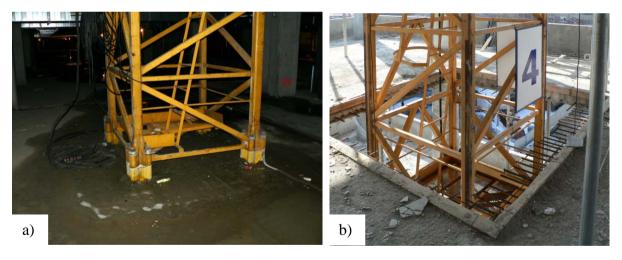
a) Crane Placement on Structure Base Structure, b) Assembly Hole
